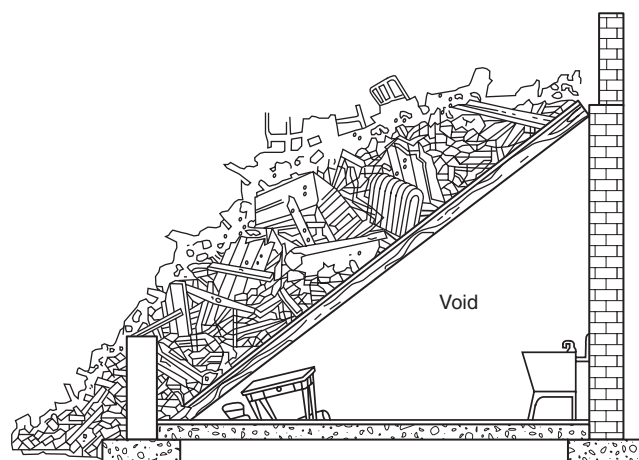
(a) Lean-To Floor Collapse. (Courtesy of U.S. Department of Civil Defense)
